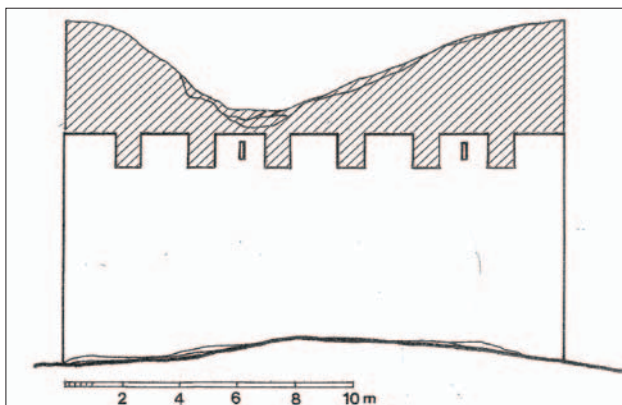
Velika castle, the second half of the 13th century, the appearance of the crenellation was preserved due to it being upgraded (drawing by: Z. Horvat)
